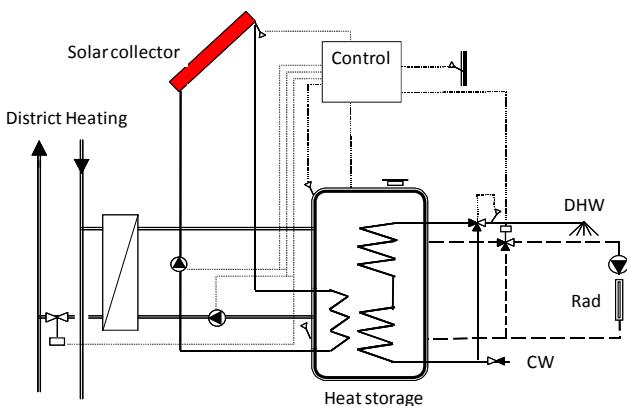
Heat storage for solar and district heating for single dwelling (Zinko, 2003).
